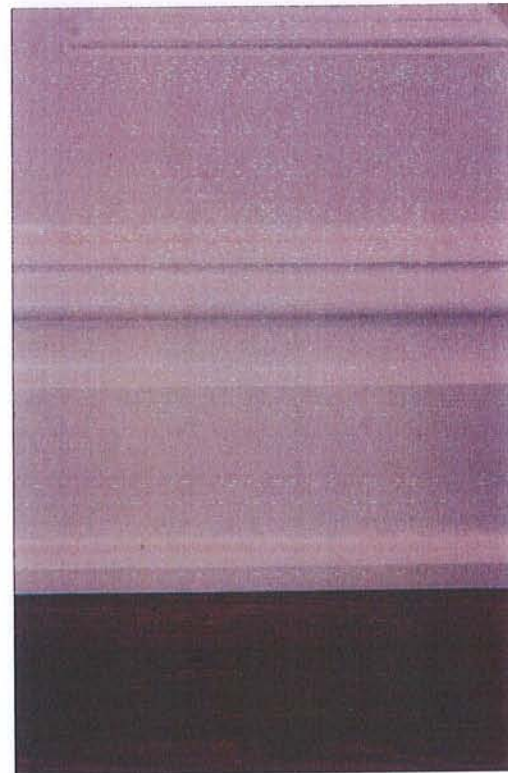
Detail of baseboard molding found throughout the house (taken in parlor)
